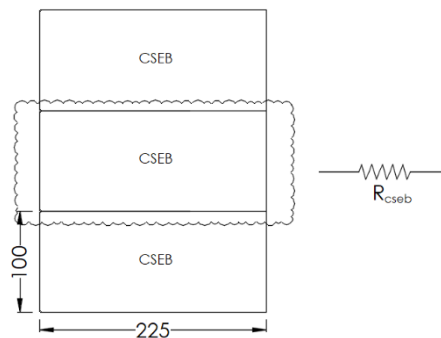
Details of a cross section – 225mm thick CSEB wall.
